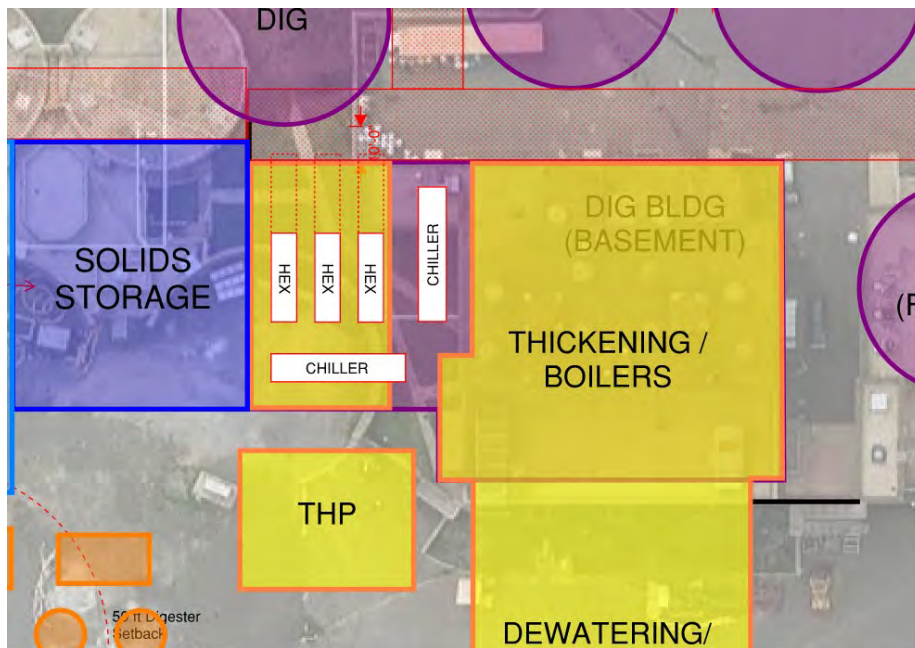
Air-Cooled Chiller: Equipment Plan View—Decommission Dewatering Building Option
